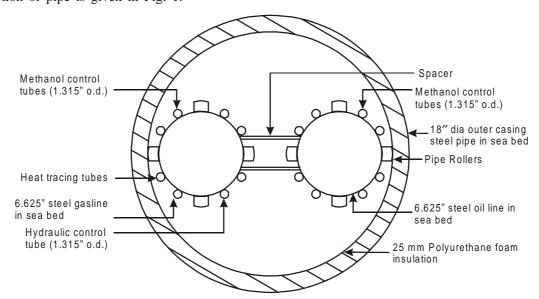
Offshore Oil/Gas Exploration Pipe line.
